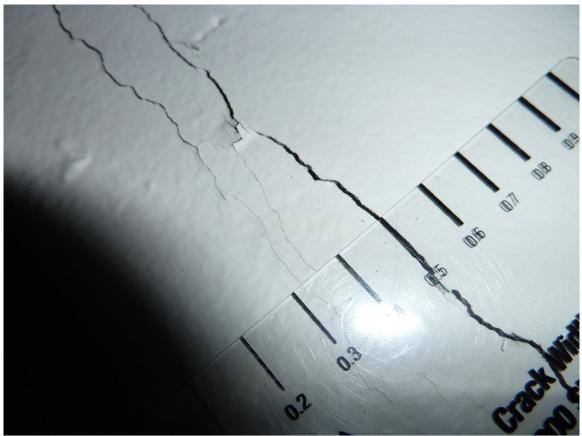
Diagonal crack approximately 0.5mm wide on the west wall interior
